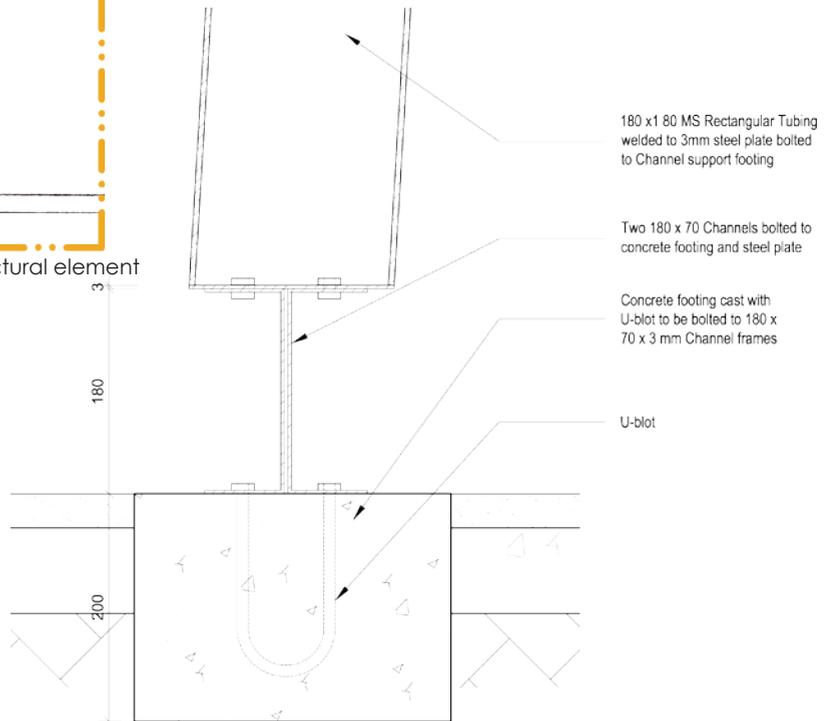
Detail for rectangular tubing fixed to ground surface
